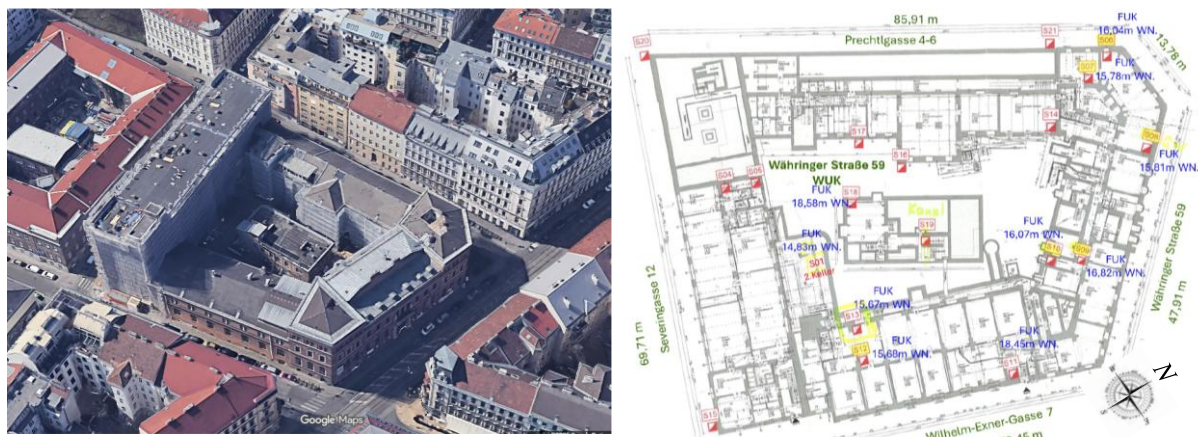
Aerial view of the WUK building (left). Plan of the excavations for the investigation of the foundations (right)
